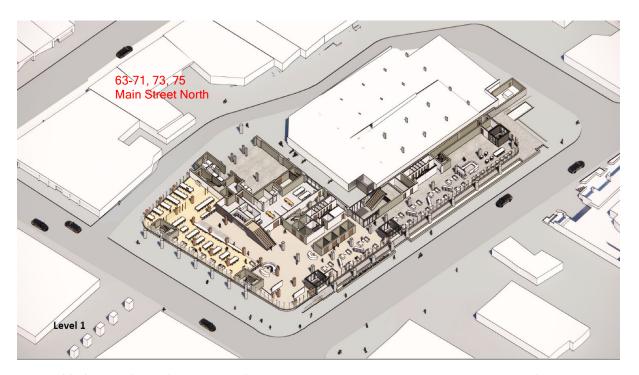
Ground floor of proposed BCFI showing relation to listed heritage structures, facing east (prepared by Diamond Schmitt Architects (subject to change)
